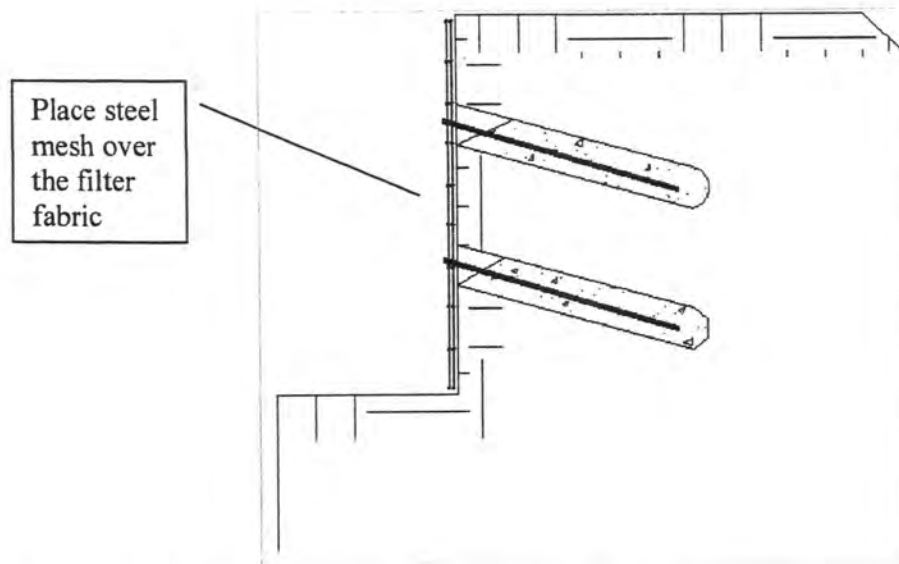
Picture showing step 6 of the construction process of Soil Nail wall
